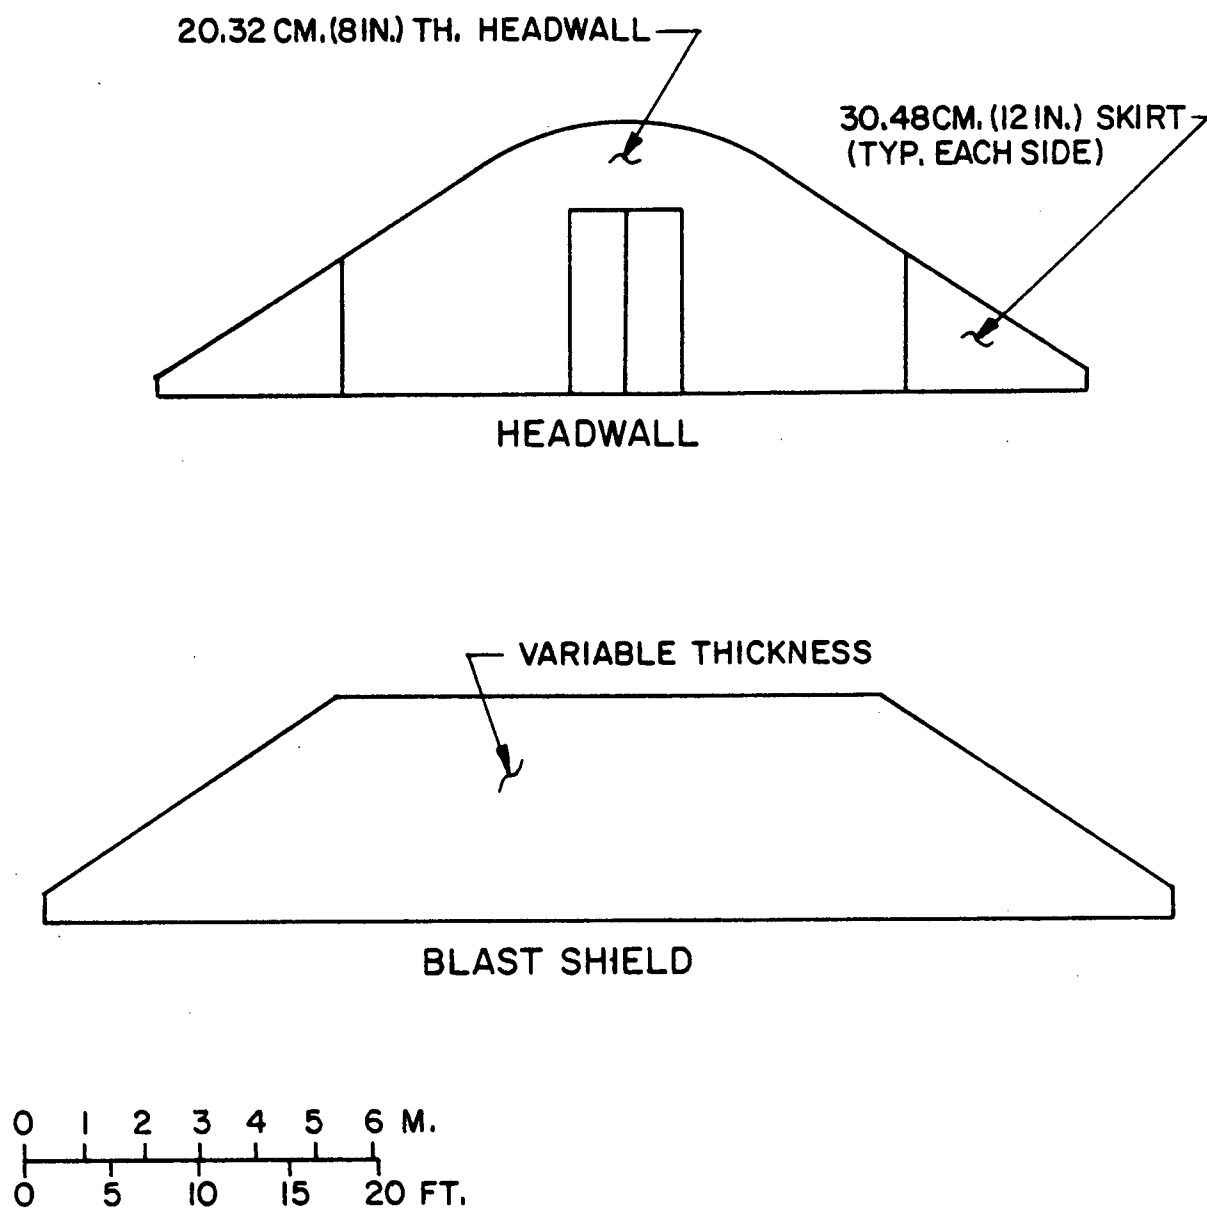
Schematic Drawing of Igloo Magazine and Blast Shield.
